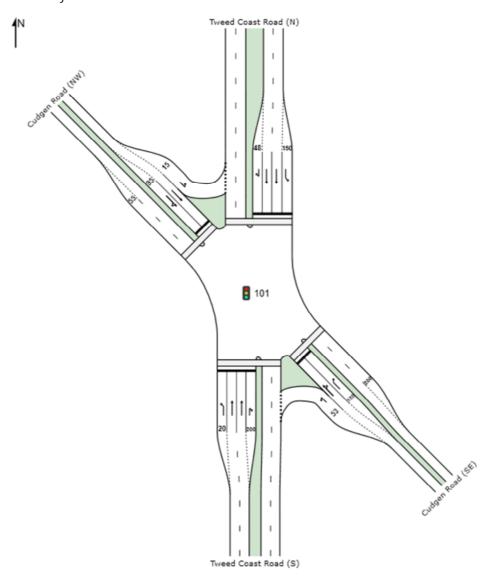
Tweed Coast Road / Cudgen Road SIDRA Intersection Layout – Upgrade 3
